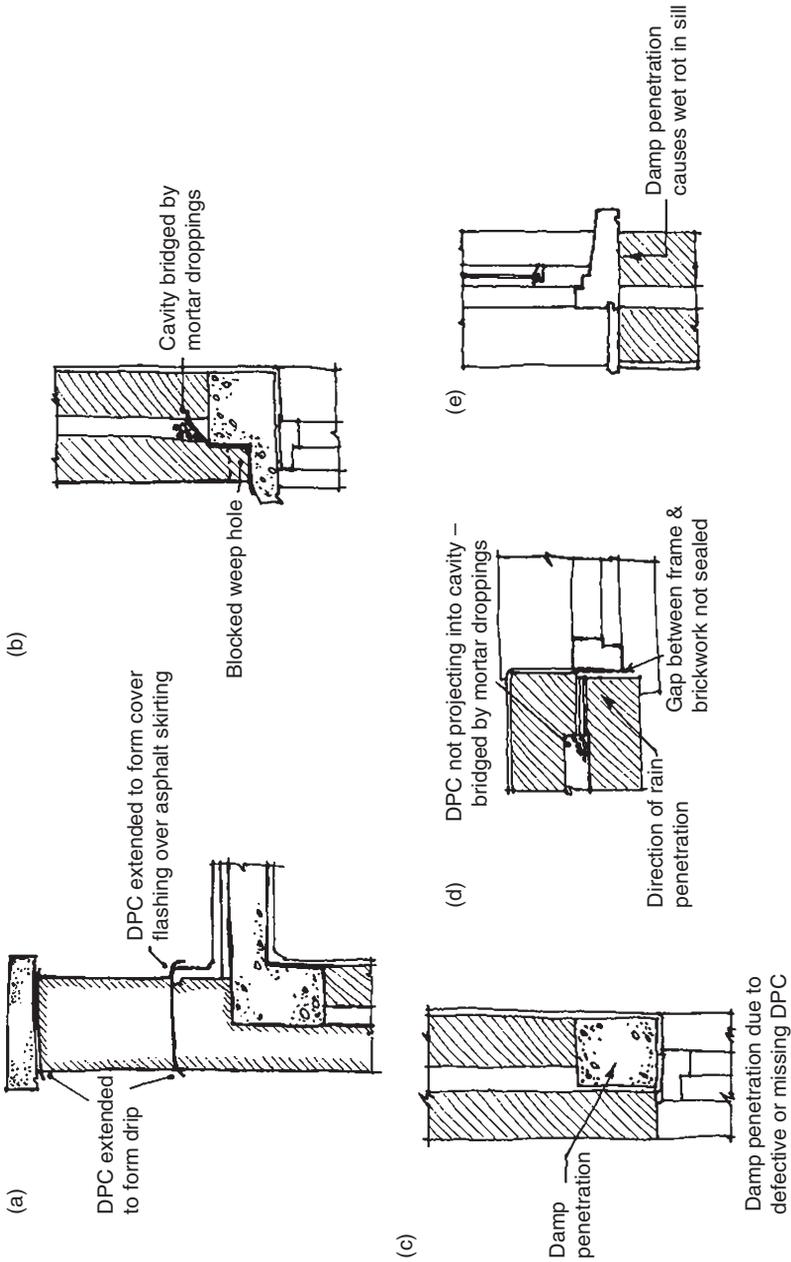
(a) Correct detail for DPCs in solid parapet wall. (b) Bridging of DPC over opening. (c) Damp penetration due to defective or missing DPC. (d) Damp penetration due to poor detailing of DPCs and jointing to reveal opening. (e) Damp penetration due to omission of DPC under sill
